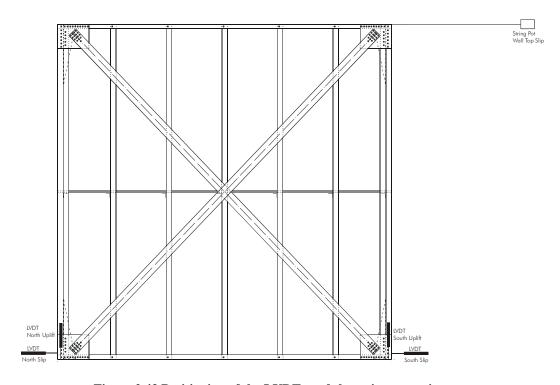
Positioning of the LVDTs and the string potentiometer
